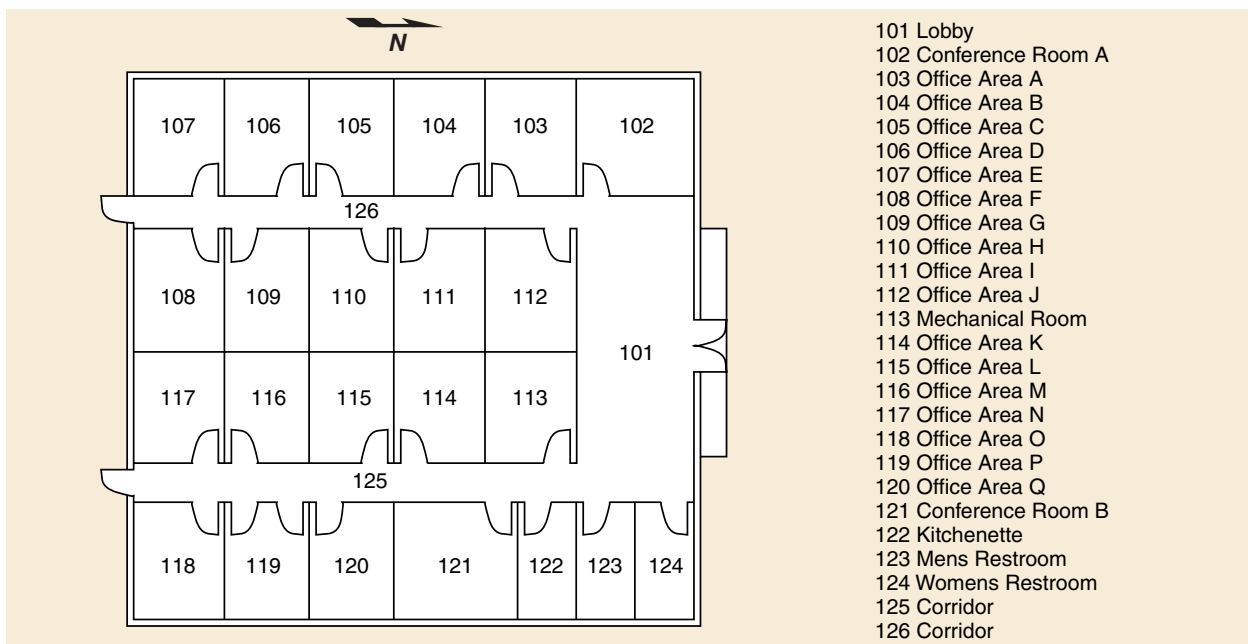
Building 5 Detailed Floor Plan, Astrotech
